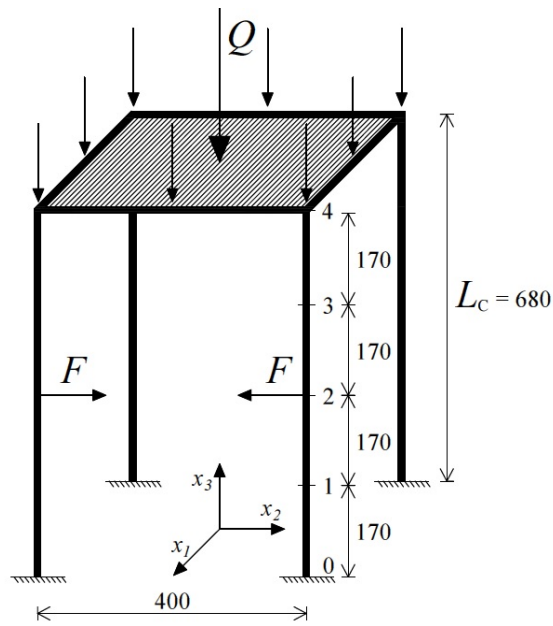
Method proposed by Tullini.<sup>9</sup> Layout verification tests with locations of instrumented sections. Units: mm.
